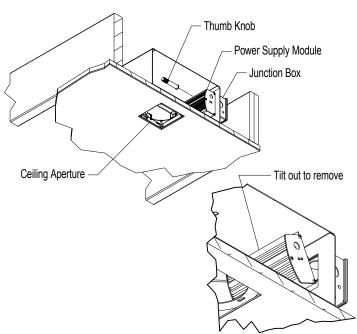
Remove Thumb Knob & Disengage Power Supply Module
